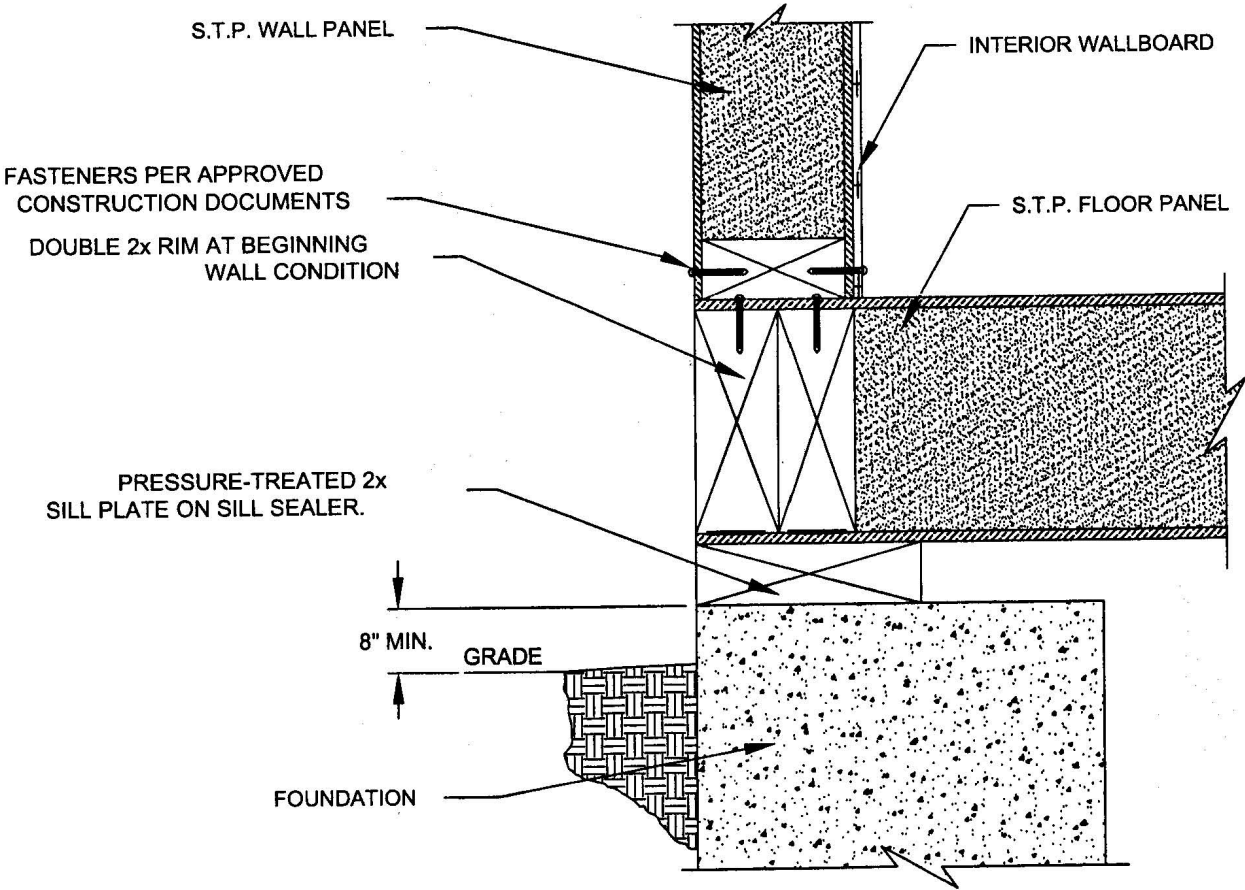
FOUNDATION AND WALL CONNECTIONS
